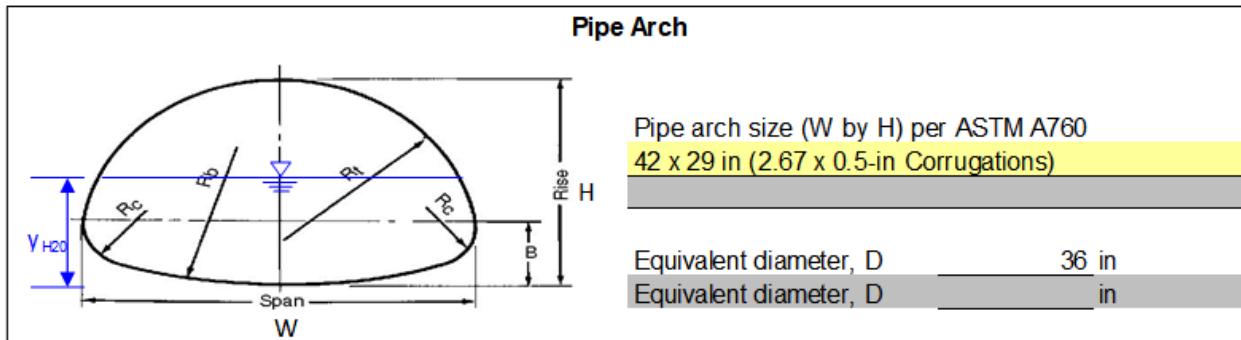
Step 1 of Steel and Aluminum Pipe worksheet: ASTM A760 arch pipe dimensions.
